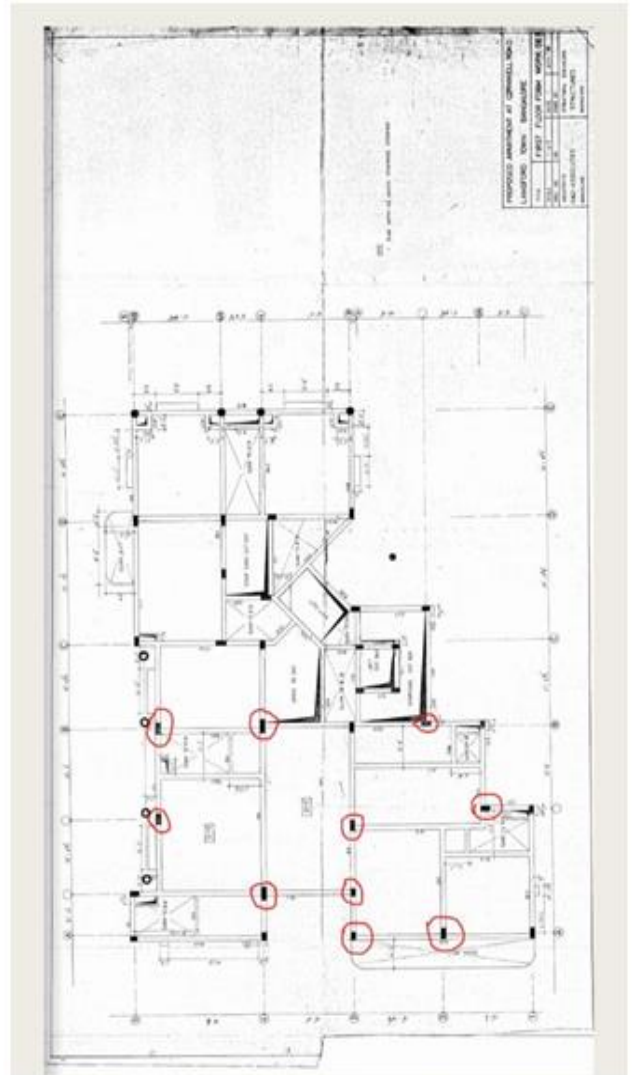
Basement Layout plan indicating Columns that were tested for strength evaluation.
